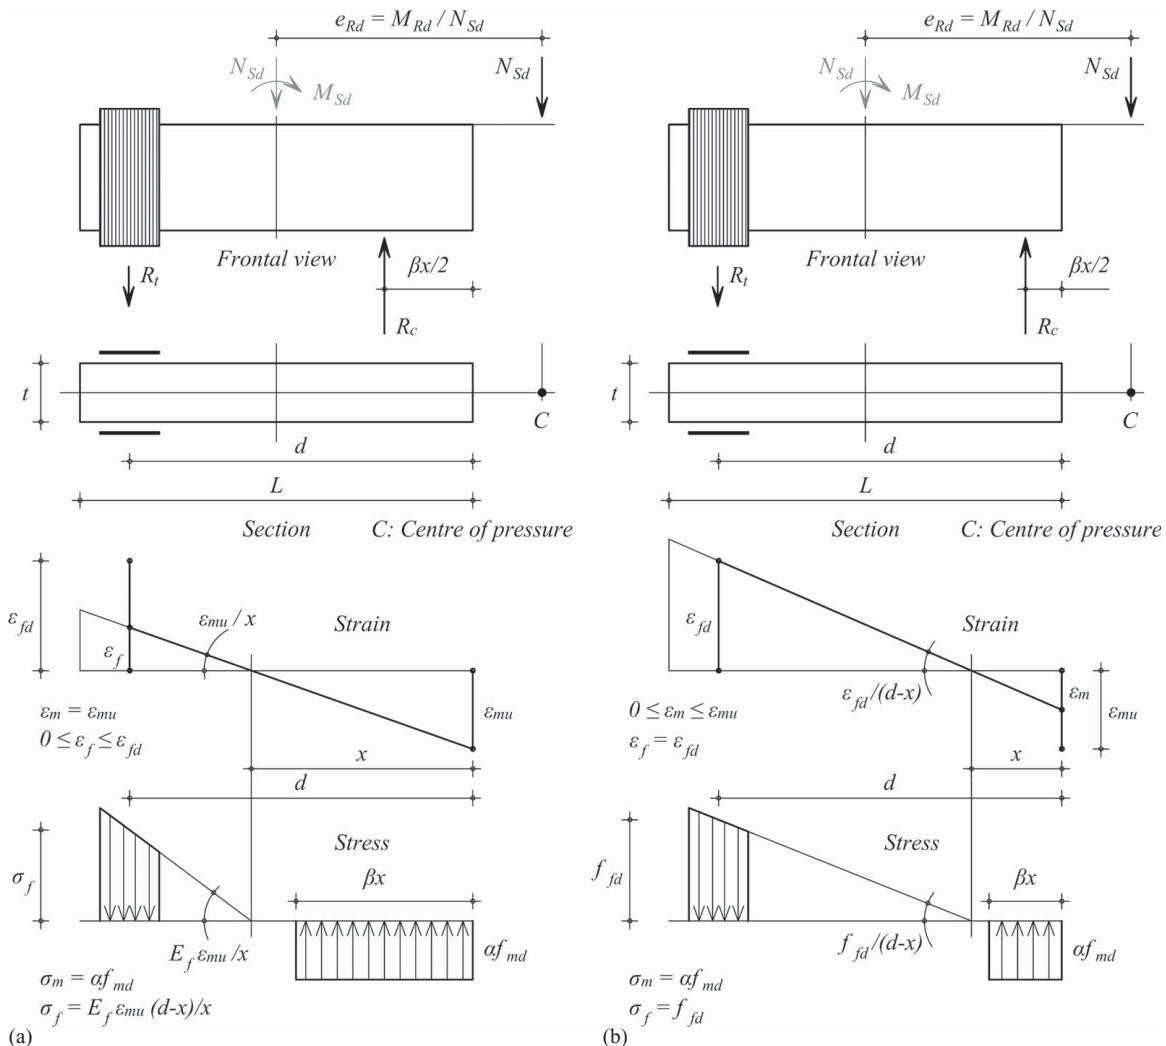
Cross-section failure mode: (a) compressive failure of masonry; and (b) tensile failure of reinforcement.
